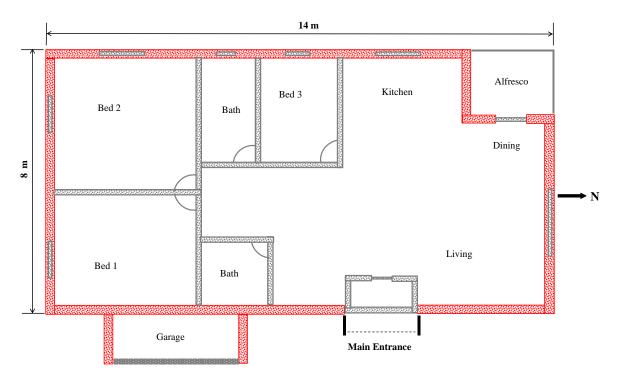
A plan view of a typical Australian 3 bedrooms house
